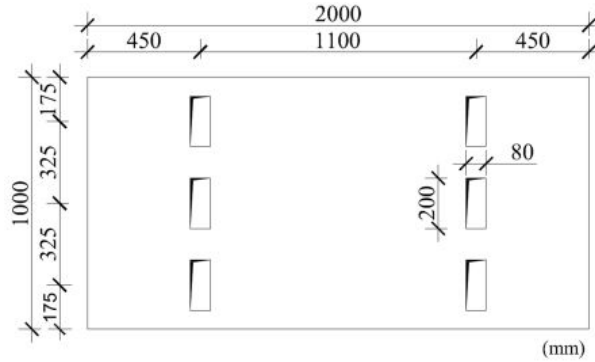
Dimensions of the precast SFRSCC slabs.
